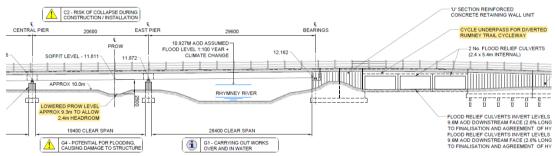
Extract from Highway Plan identifying changes to levels to accommodate routes of existing PRoW to north and south of the River below new bridge structure
